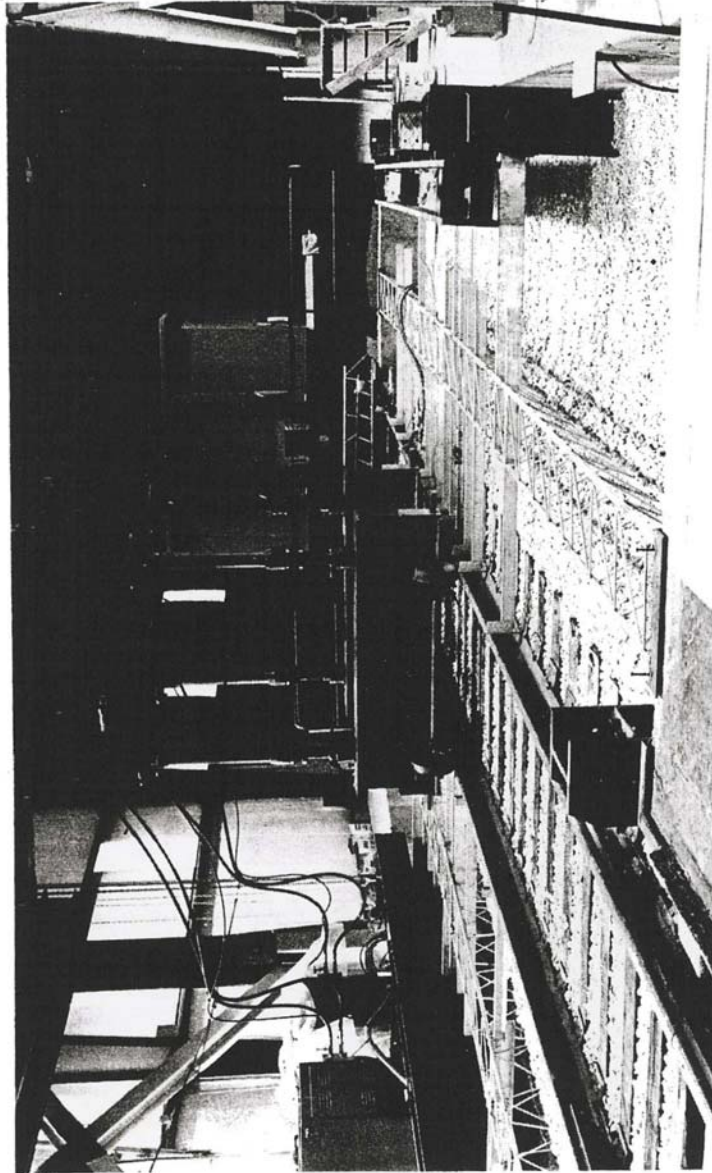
Test Set Up Showing Hydraulic Loading Jacks, Loading Bolster, Vertical Instrumentation, and Reference Fram.
